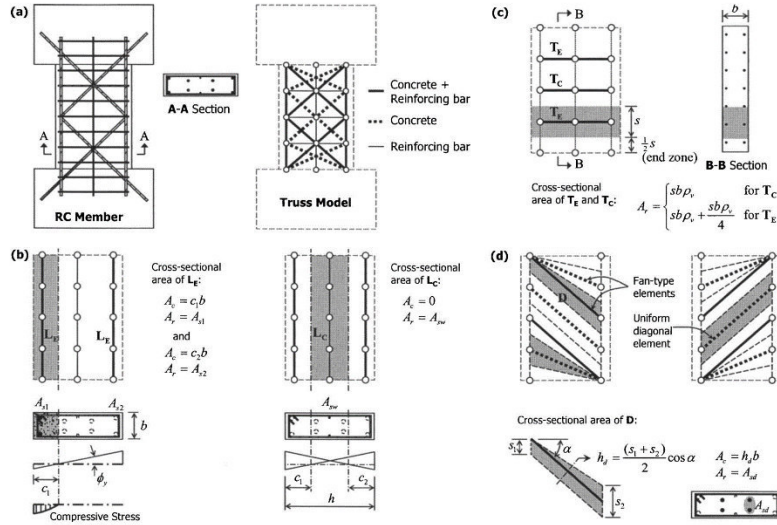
Modeling of concrete and reinforcing steel elements [Park and Eom (2007)]
